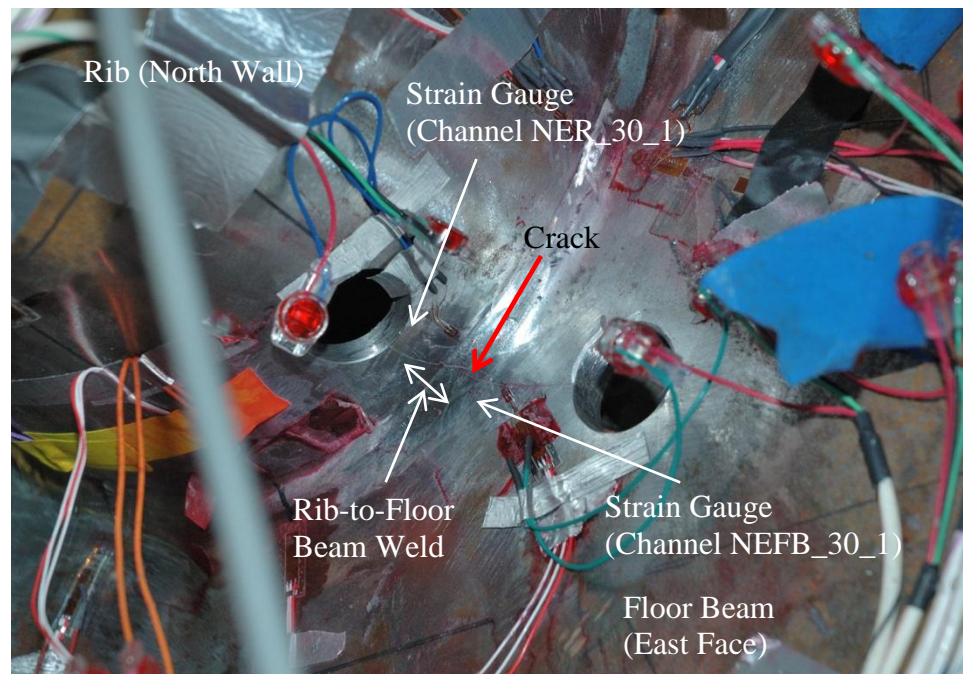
Crack at the floor beam-to-rib welded connection in the mock-up specimen MU1 – north east
